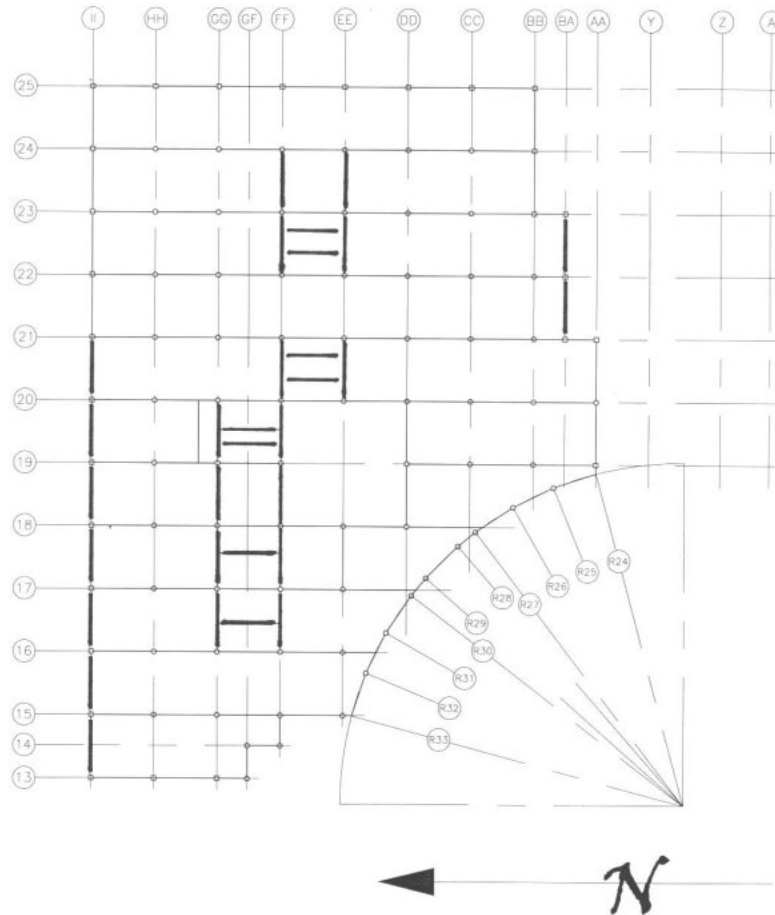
Concrete columns that serve as the gravity system for The Medical Office Building and an architectural continuation from the existing office buildings
